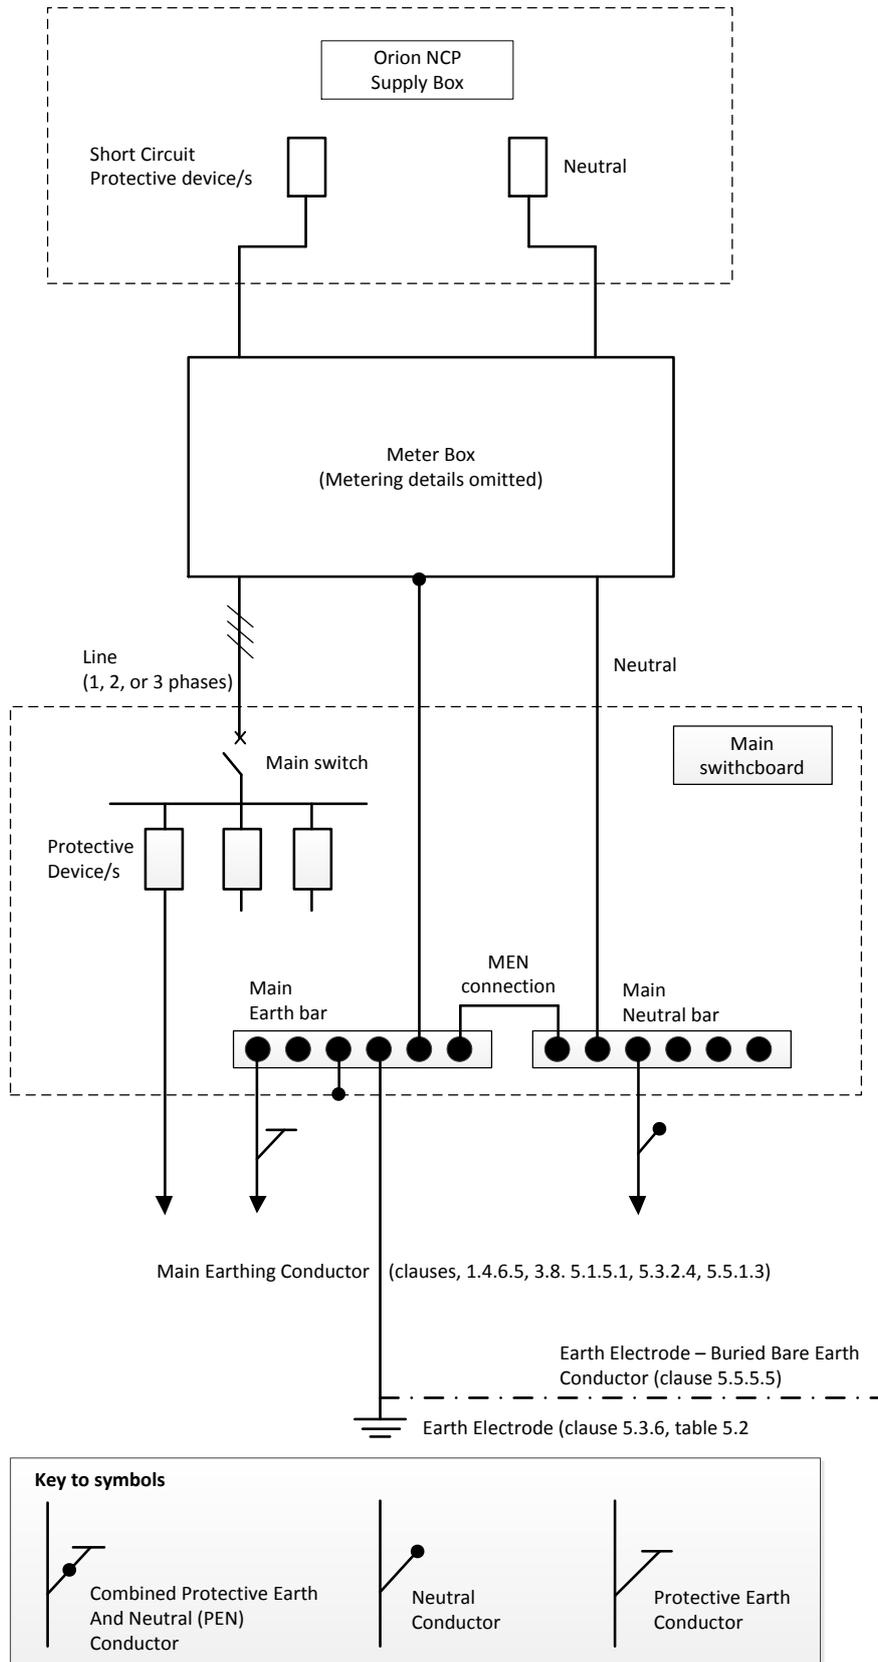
shows a typical Multiple Earthed Neutral (MEN) System of Earthing - General Arrangement for electrical installations with a single switchboard with example clauses from AS/NZS 3000 when considering Main Earth Conductors and Earth Electrodes.
